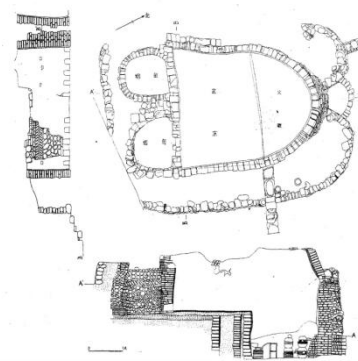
Cross-sectional view of the kiln structure from the "Excavation Brief of the Guantai Kiln Site in Ci-County, Hebei Province"
